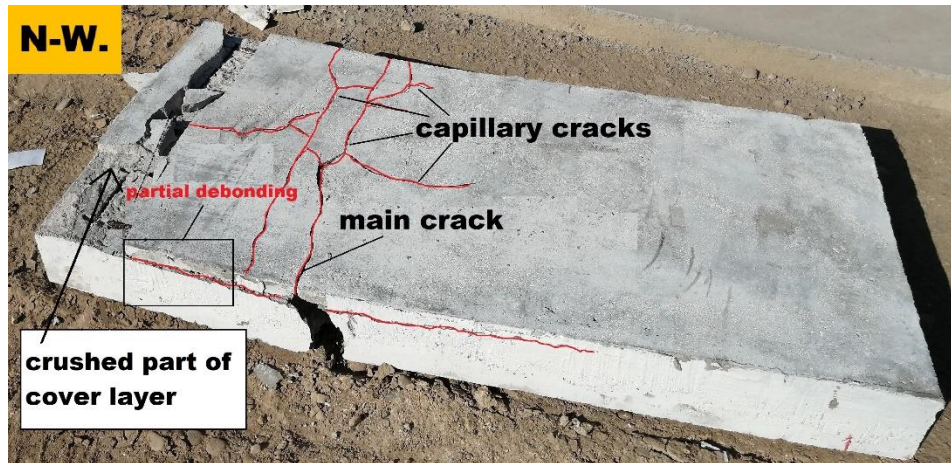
Mode of failure and crack patterns for specimen N-W.
